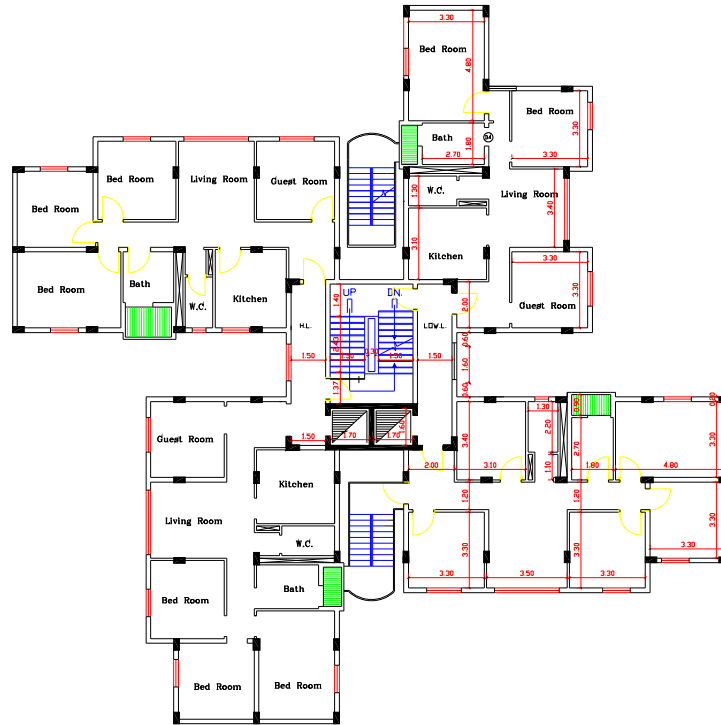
Typical floor plan for typical building at El-Karama Housing Project
